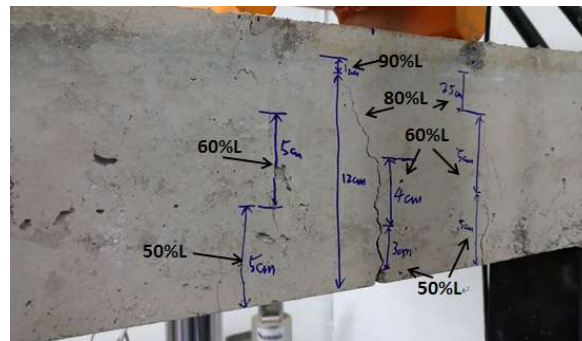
The crack propagation of concrete beam under four-point bending test
